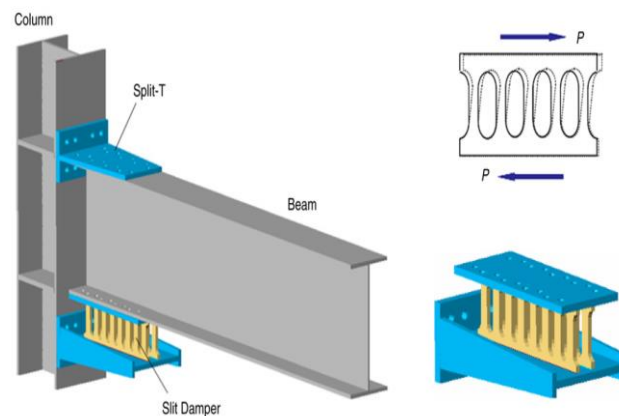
The proposed beam-to-column connection detail with slit damper (Oh. et al. 2009).
